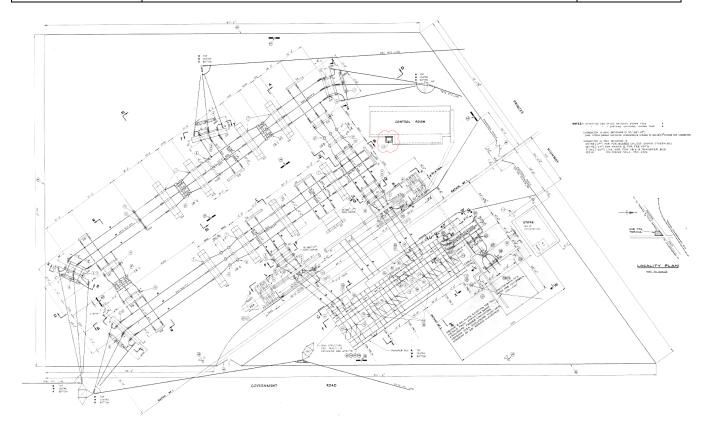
Proposed TRG zone substation general arrangement (updated drawing VX11/6791/151)
